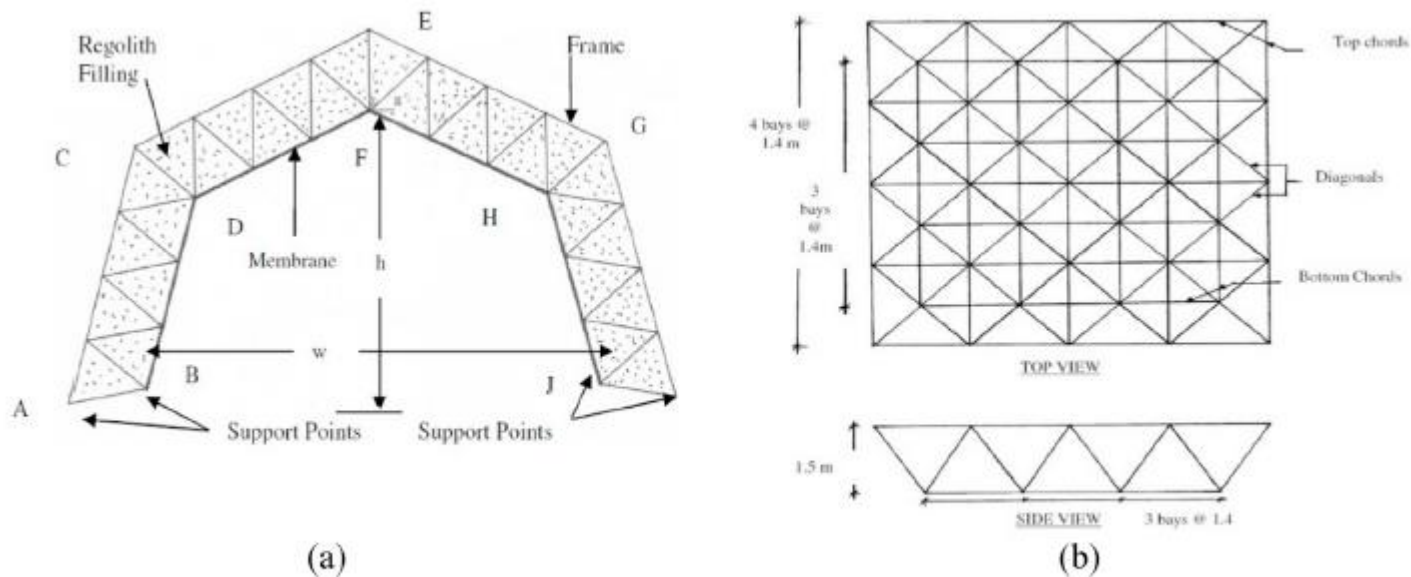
Proposed structure: a) Elevation; b) Plan and side views, Malla & Chaudhuri [137].
